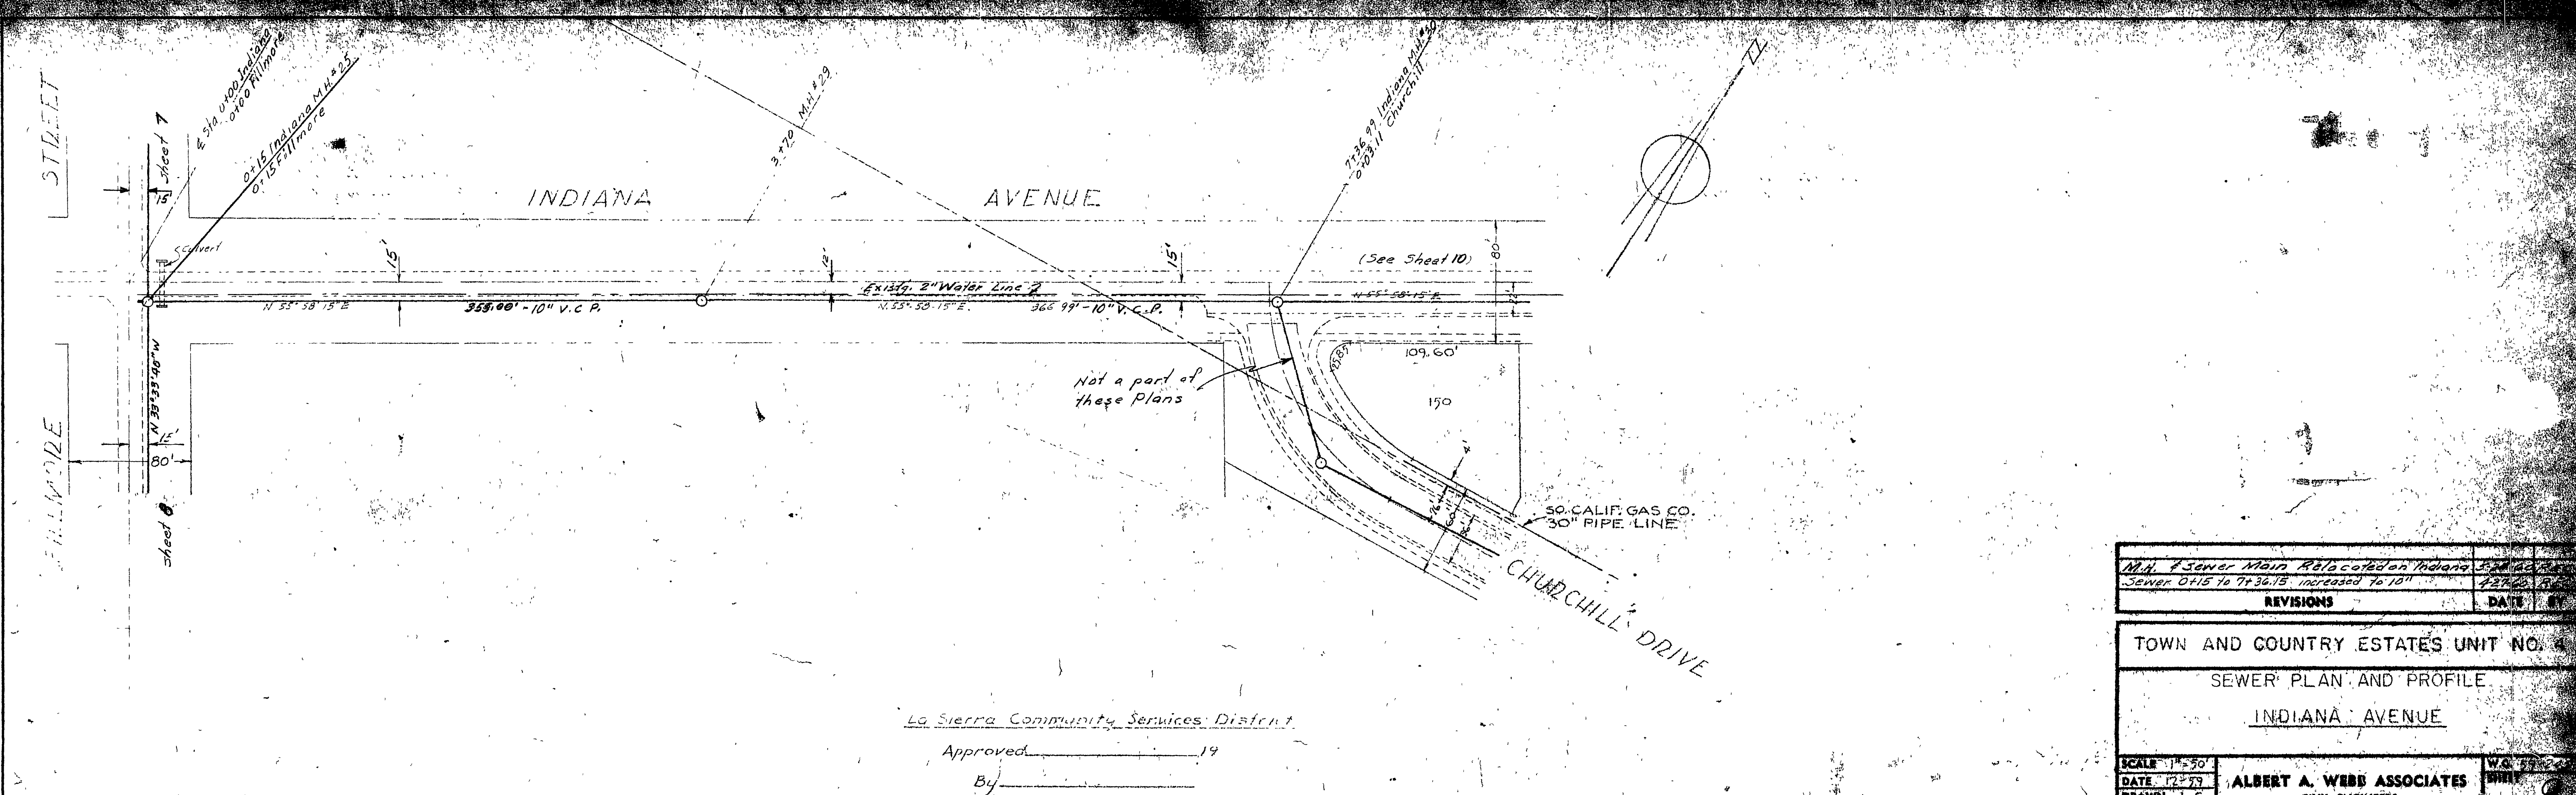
PLATE I - PLAN, PROFILE, & P.R.I.'S STANDARD
